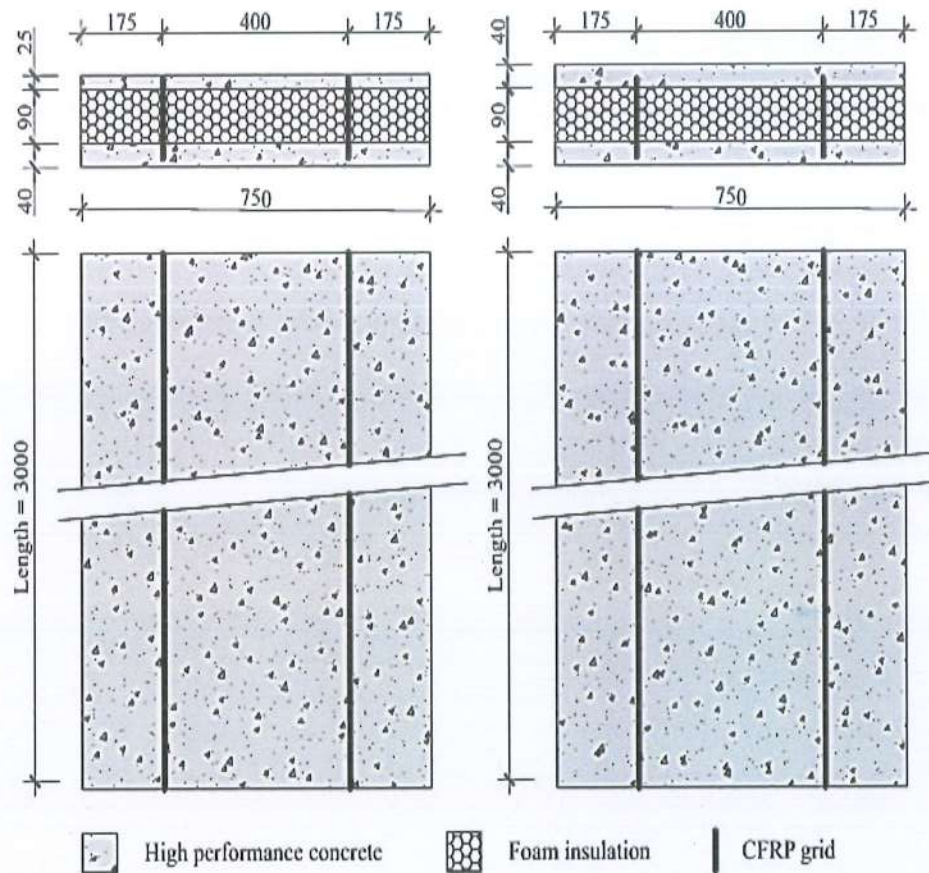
Concrete Sandwich Panels Dimensions in mm [25].
